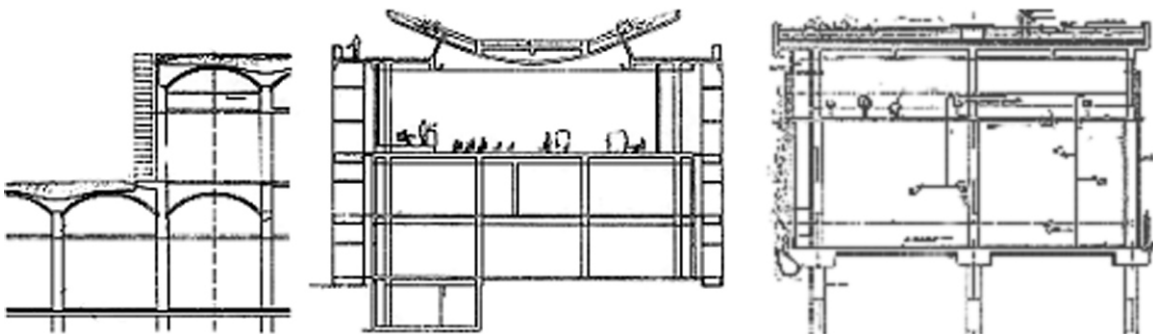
, 27, 28 Sections showing roof garden and roof pond in Sarabhai, Millowners and Museum.
